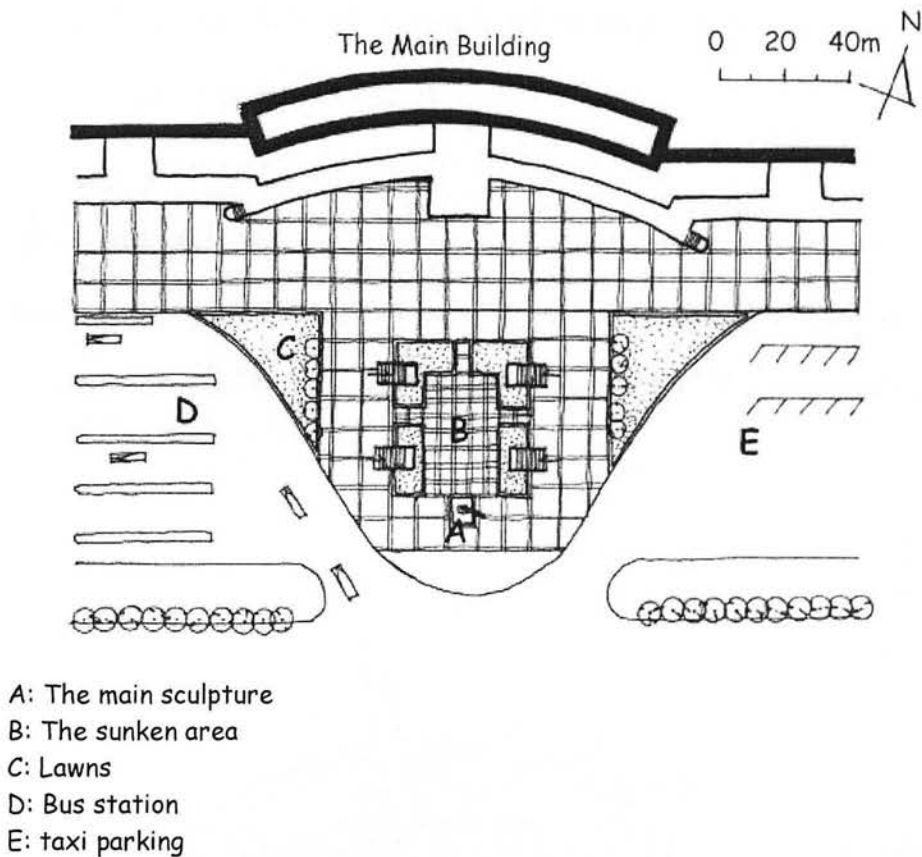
Site plan of the Northern Railway Station Square, Shenyang
